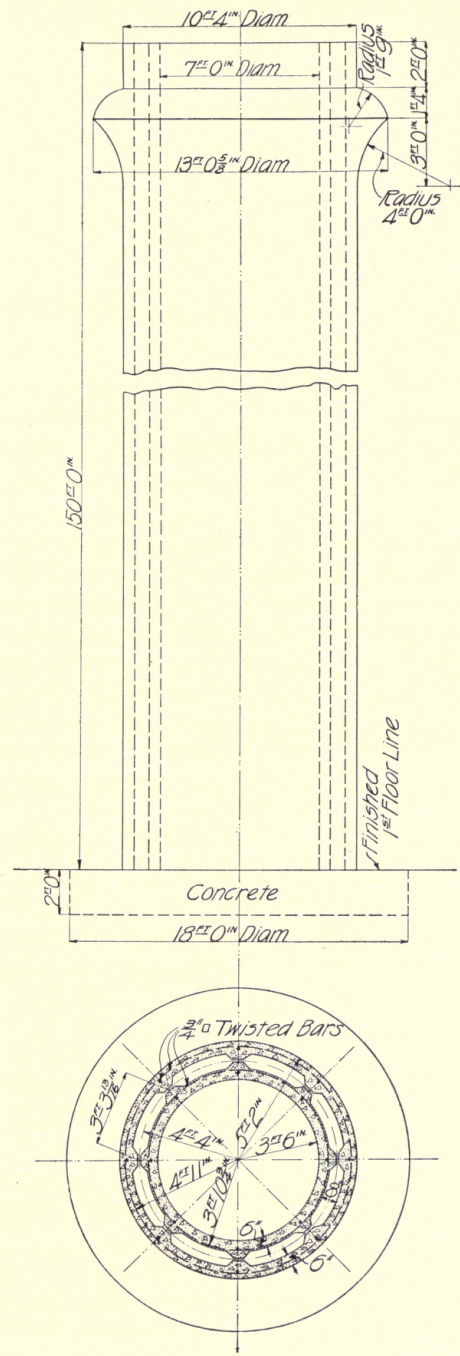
Plan and Elevation of Chimney. (See p. 52.)
